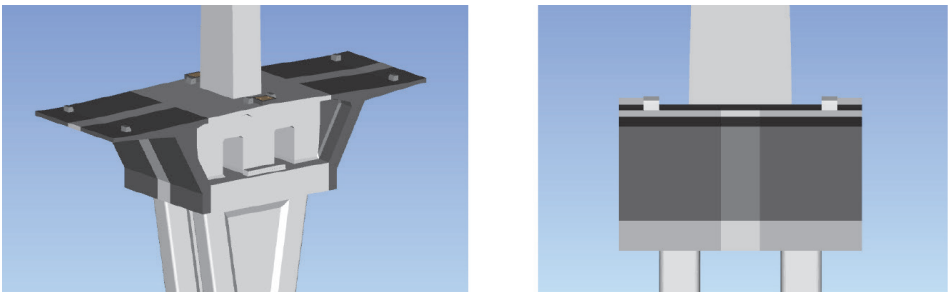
Conceptual arrangement of the hybrid precast–cast-in-place pier table integrating the lower and upper pylons of an extradosed bridge
